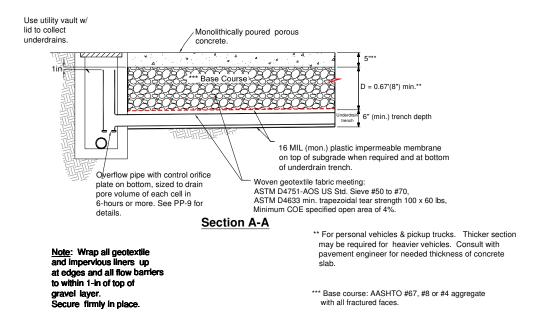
Porous Concrete Pavement (PCP) - Typical Sections
